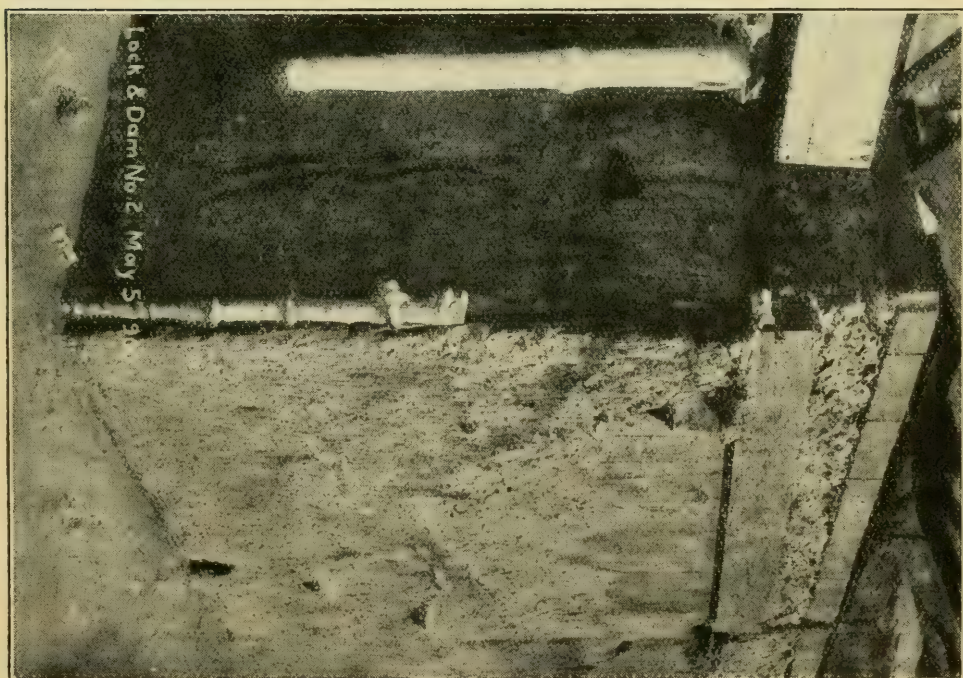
A SECTION PARALLEL TO THE DIAPHRAGM OF BOARDS, AND A FEW INCHES, ONLY, FROM IT.
